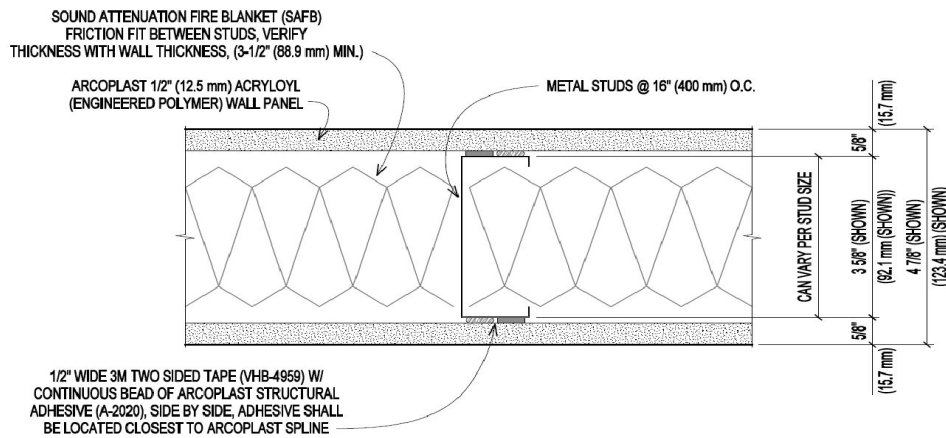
Arcoplast 1/2" wall panel partition construction detail
